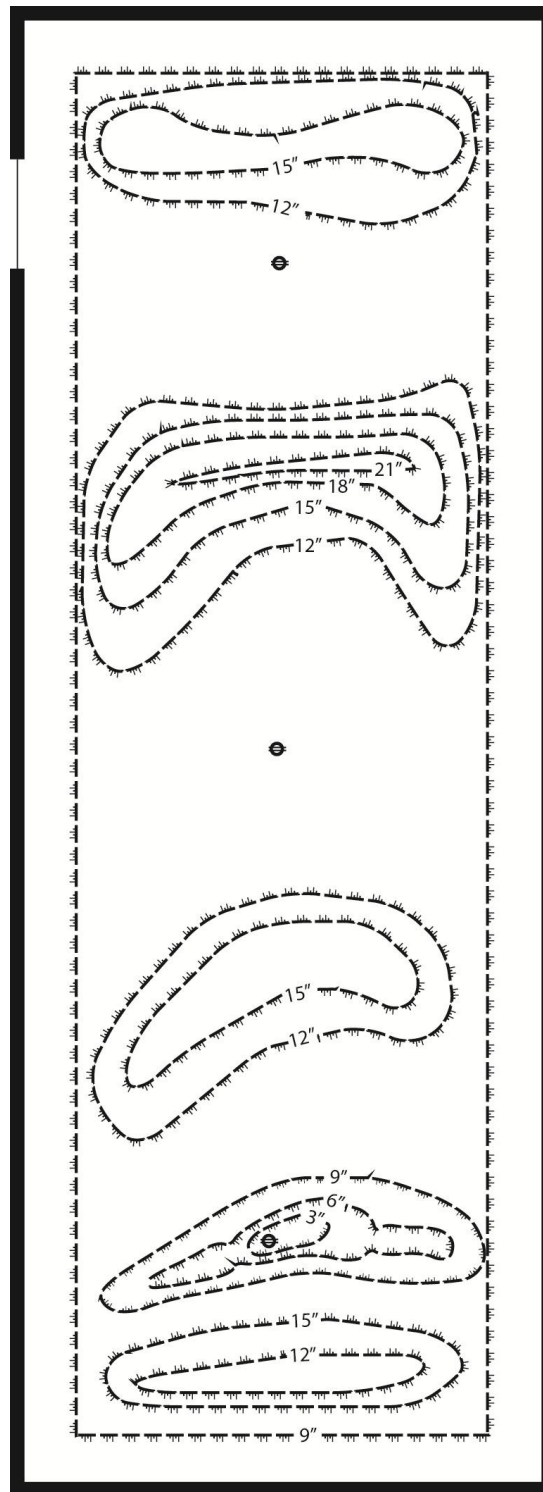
“Kildeer Roof Plan,” 4,400 square feet, illustrated by Author.
